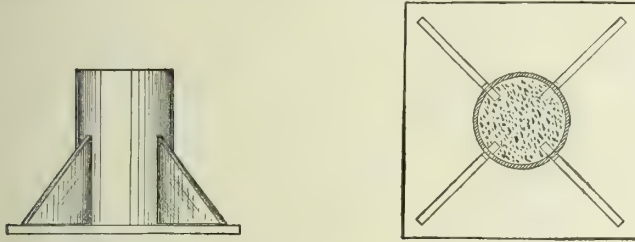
NEW STEEL BUILT-UP COLUMN BASE
